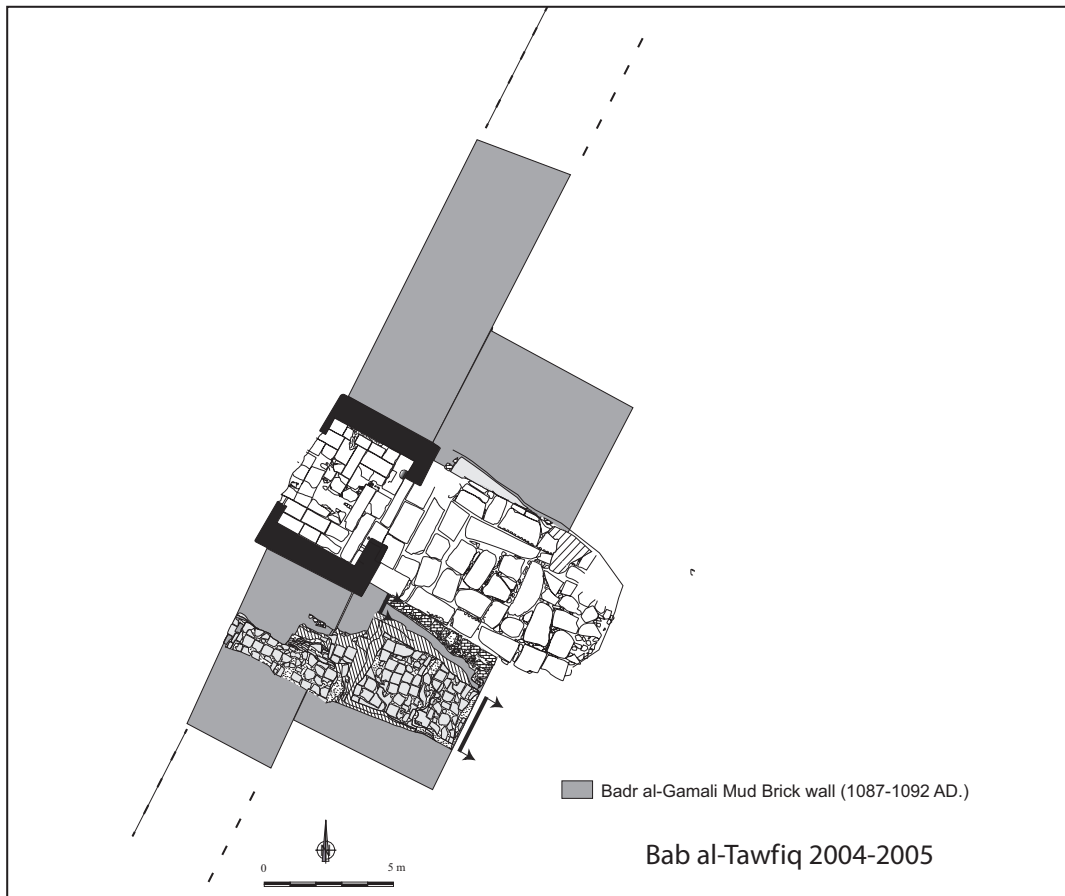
Plan and section of the Badr al-Gamali's mud brick wall connected to Bab al-Tawfiq
